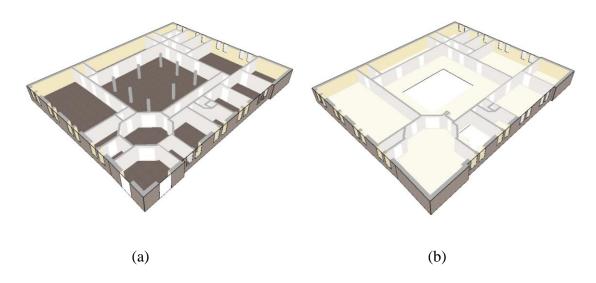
13 Ground Floor View (a) First Floor View (b) of Library's Model
